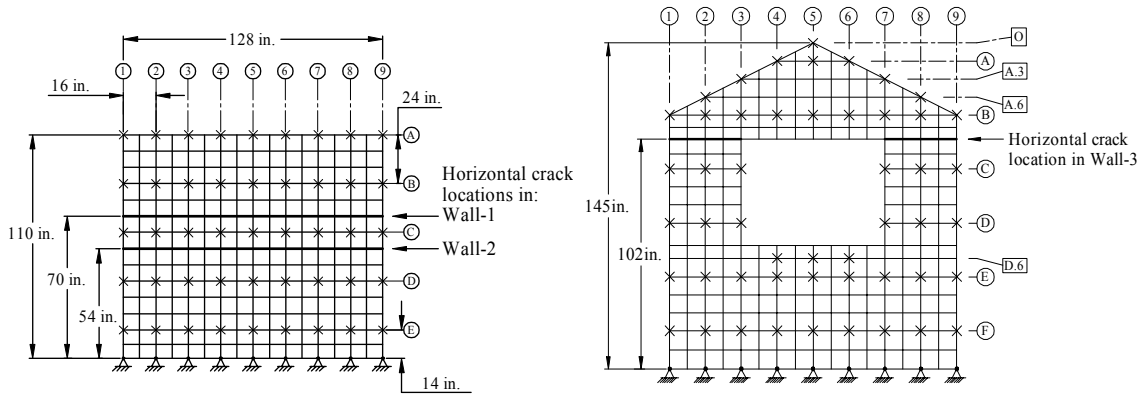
Horizontal crack hinge locations in brick veneer wall models.
